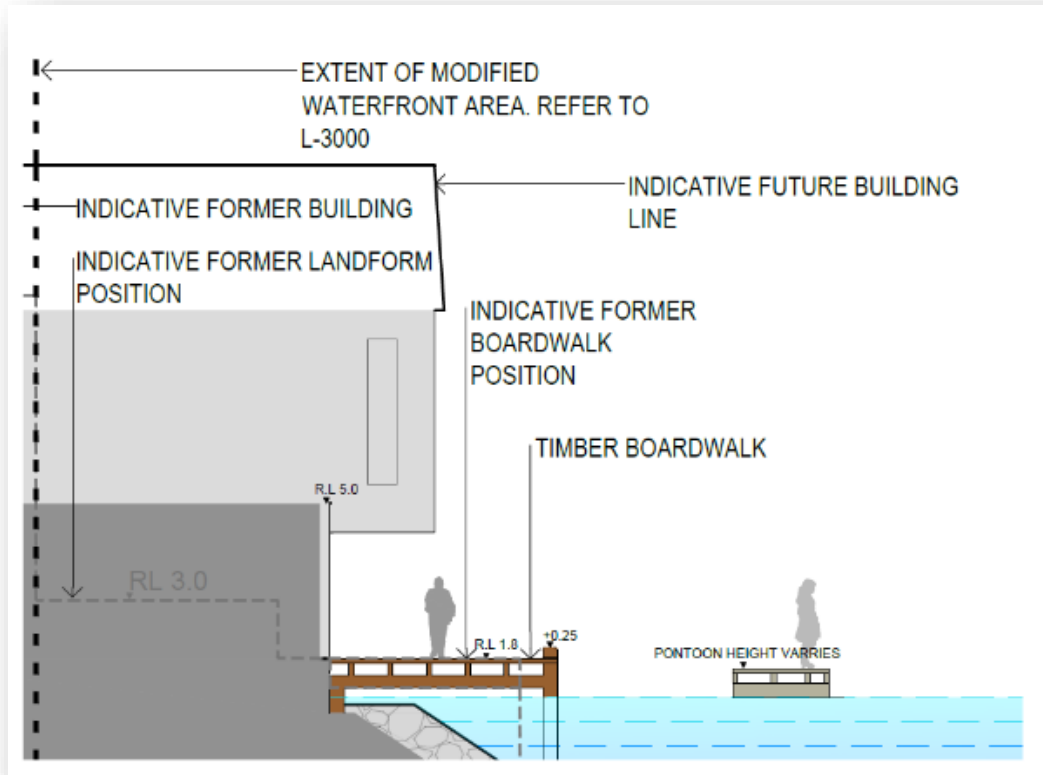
Indicative Section plan of boardwalk and Tavern undercroft
